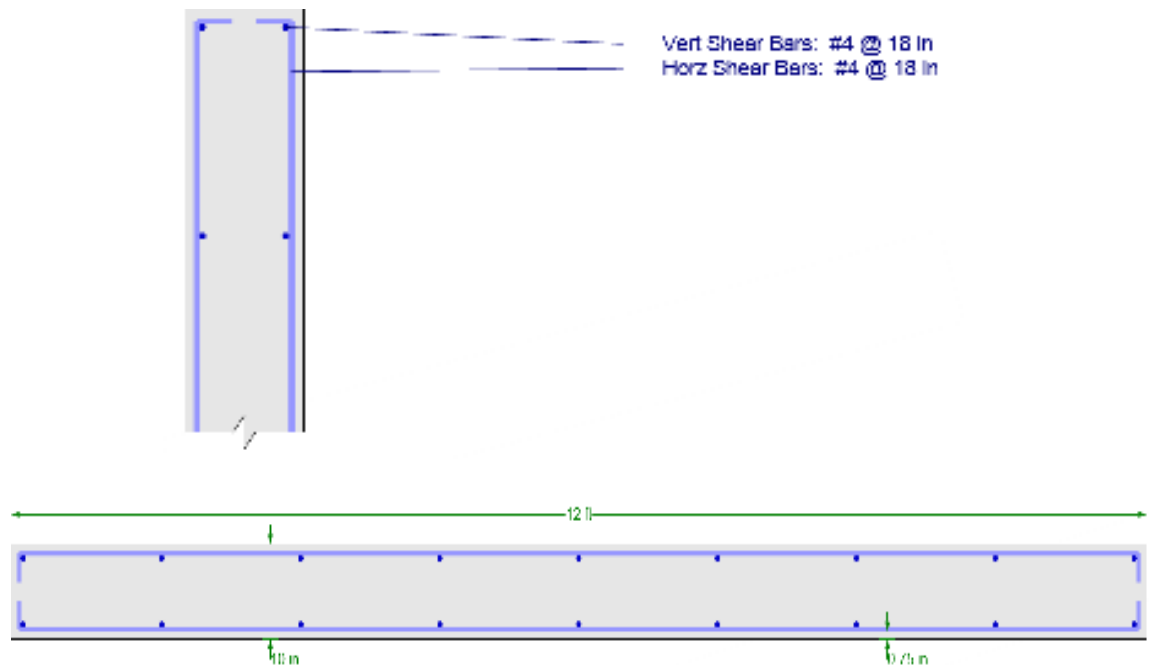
Building (B7-9S-L-S) Special RC Shear Reinforcement Details; Wall Section for Floors 4-6
